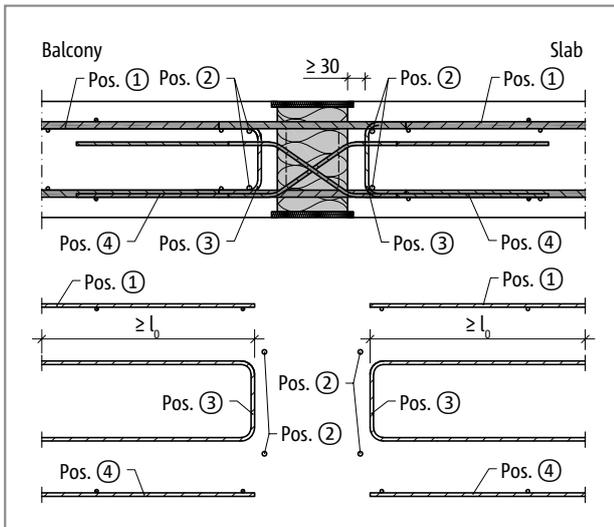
Schöck Isokorb® XT type D: On-site reinforcement
